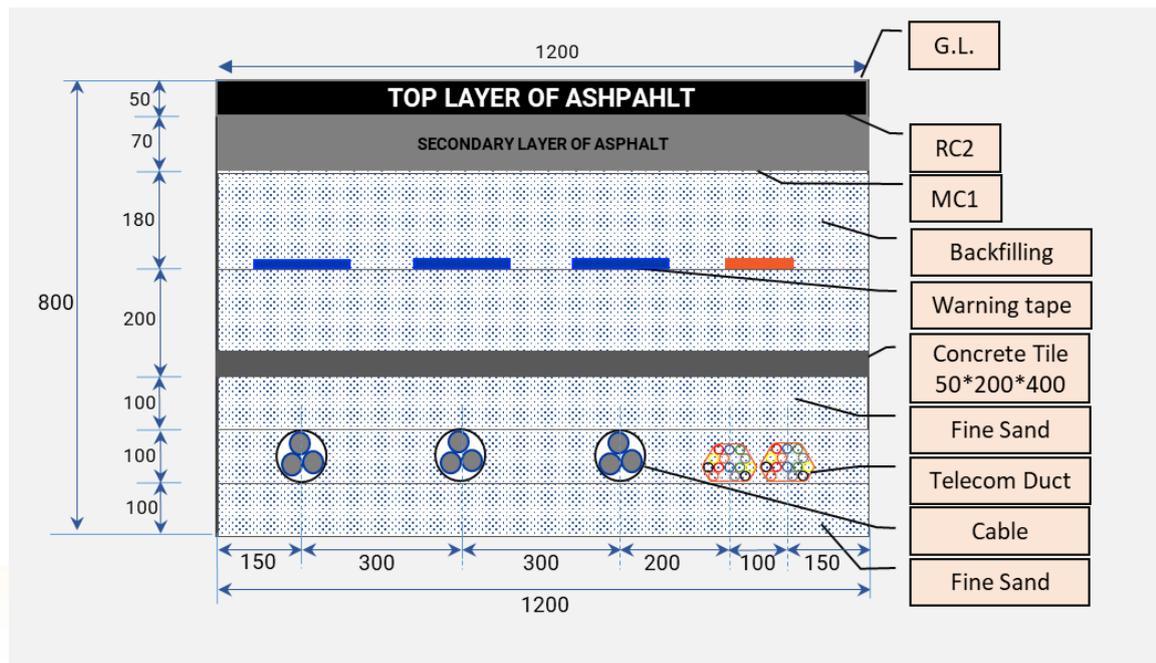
B: Normal Trench MV 3 Cables 33 KV for Interconnection Between 2 Primary Substations & 2x16-way Duct
